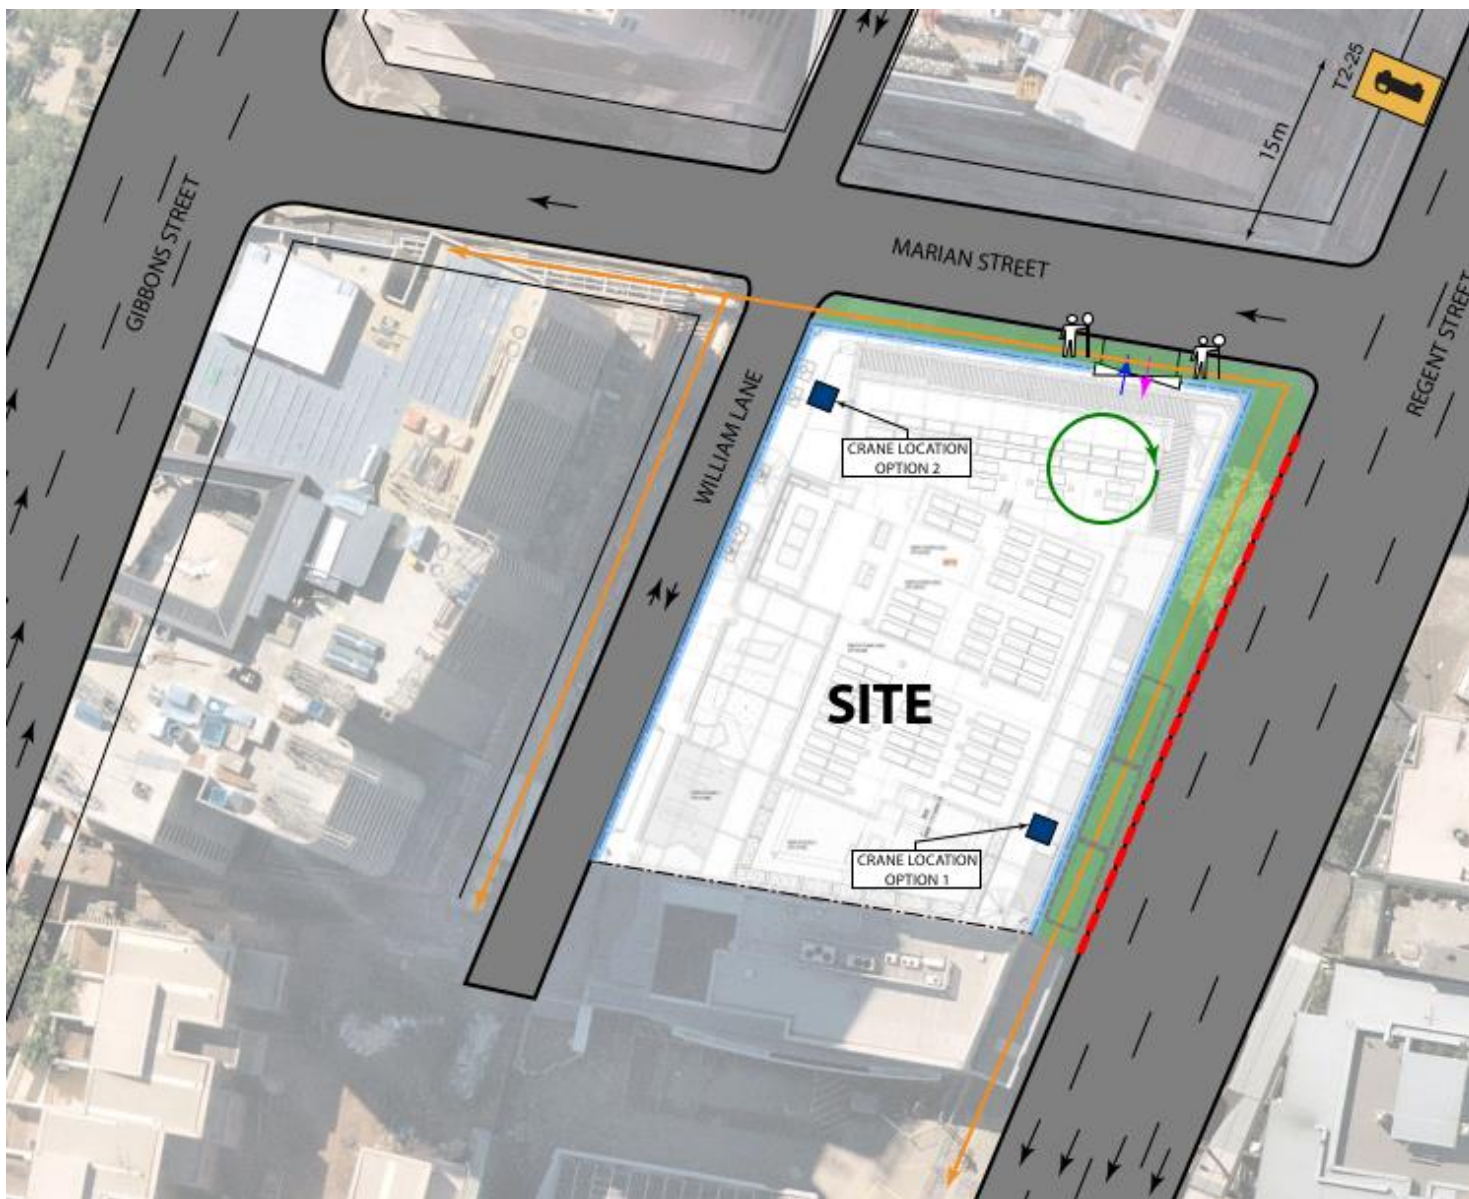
Site Plan and Proposed Loading/Crane Locations
